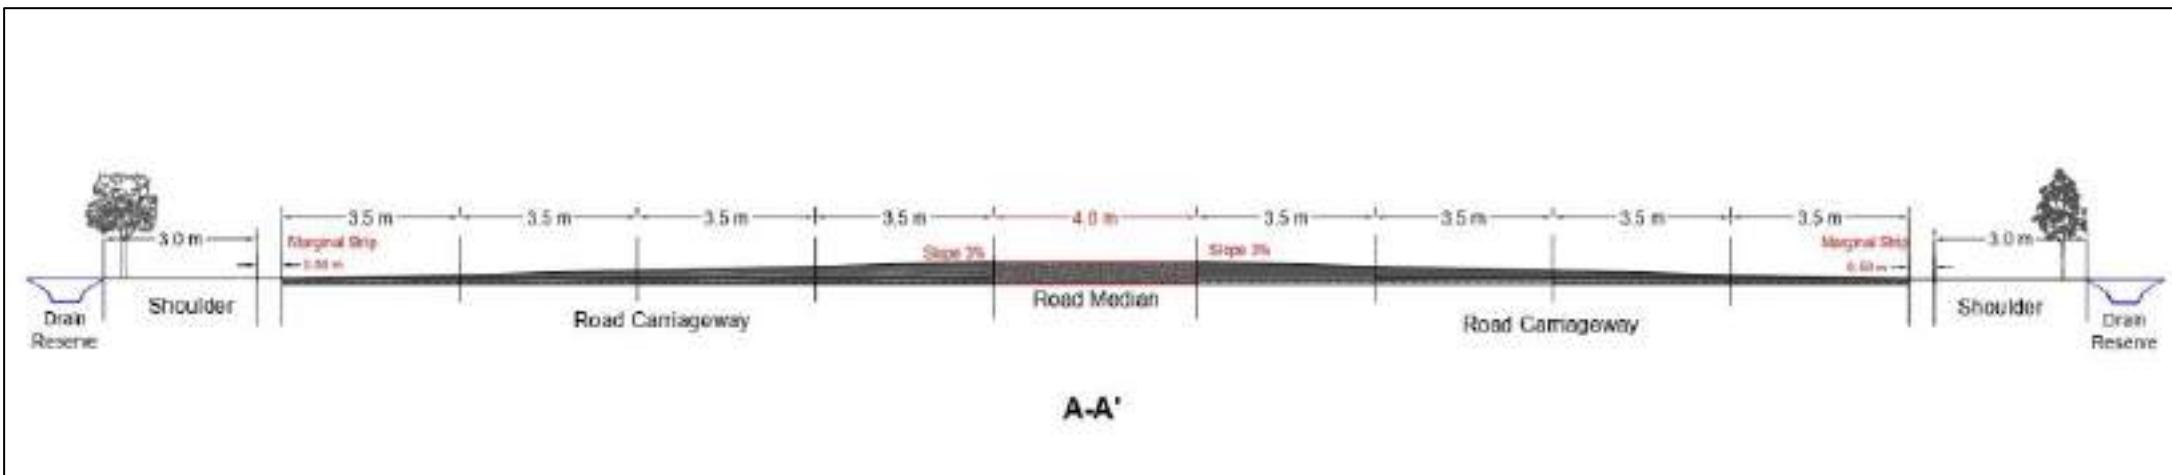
Cross Section of Jalan Kuantan-Maran Highway
